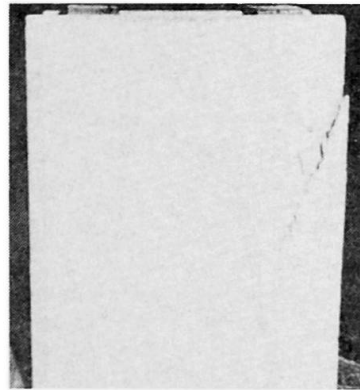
Final failure by cracking of concrete edge for no. 5
